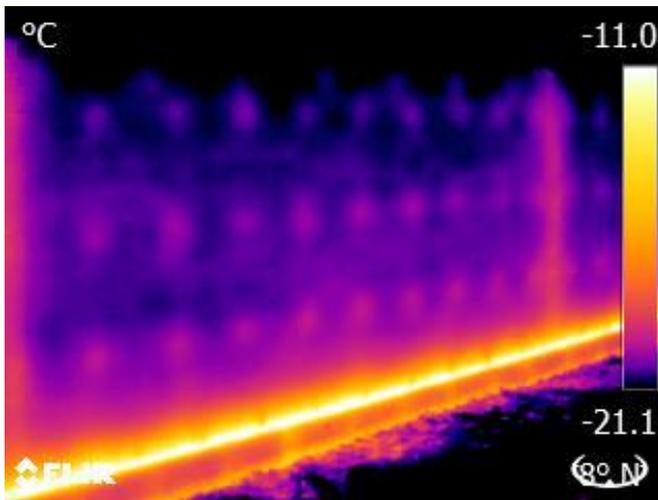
Masonry wall ties and foundation wall at grade at East elevation (refer to Photograph #57). Heat transfer through wall at ties supporting the clay brick veneer. Also, heat transfer through the foundation wall at grade.
